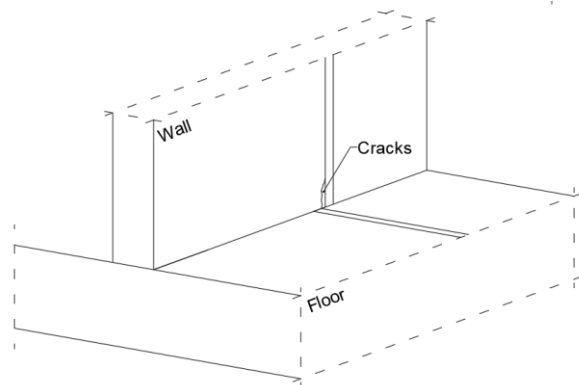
Non-aligned of expansion joints inducing cracks between the joints.
